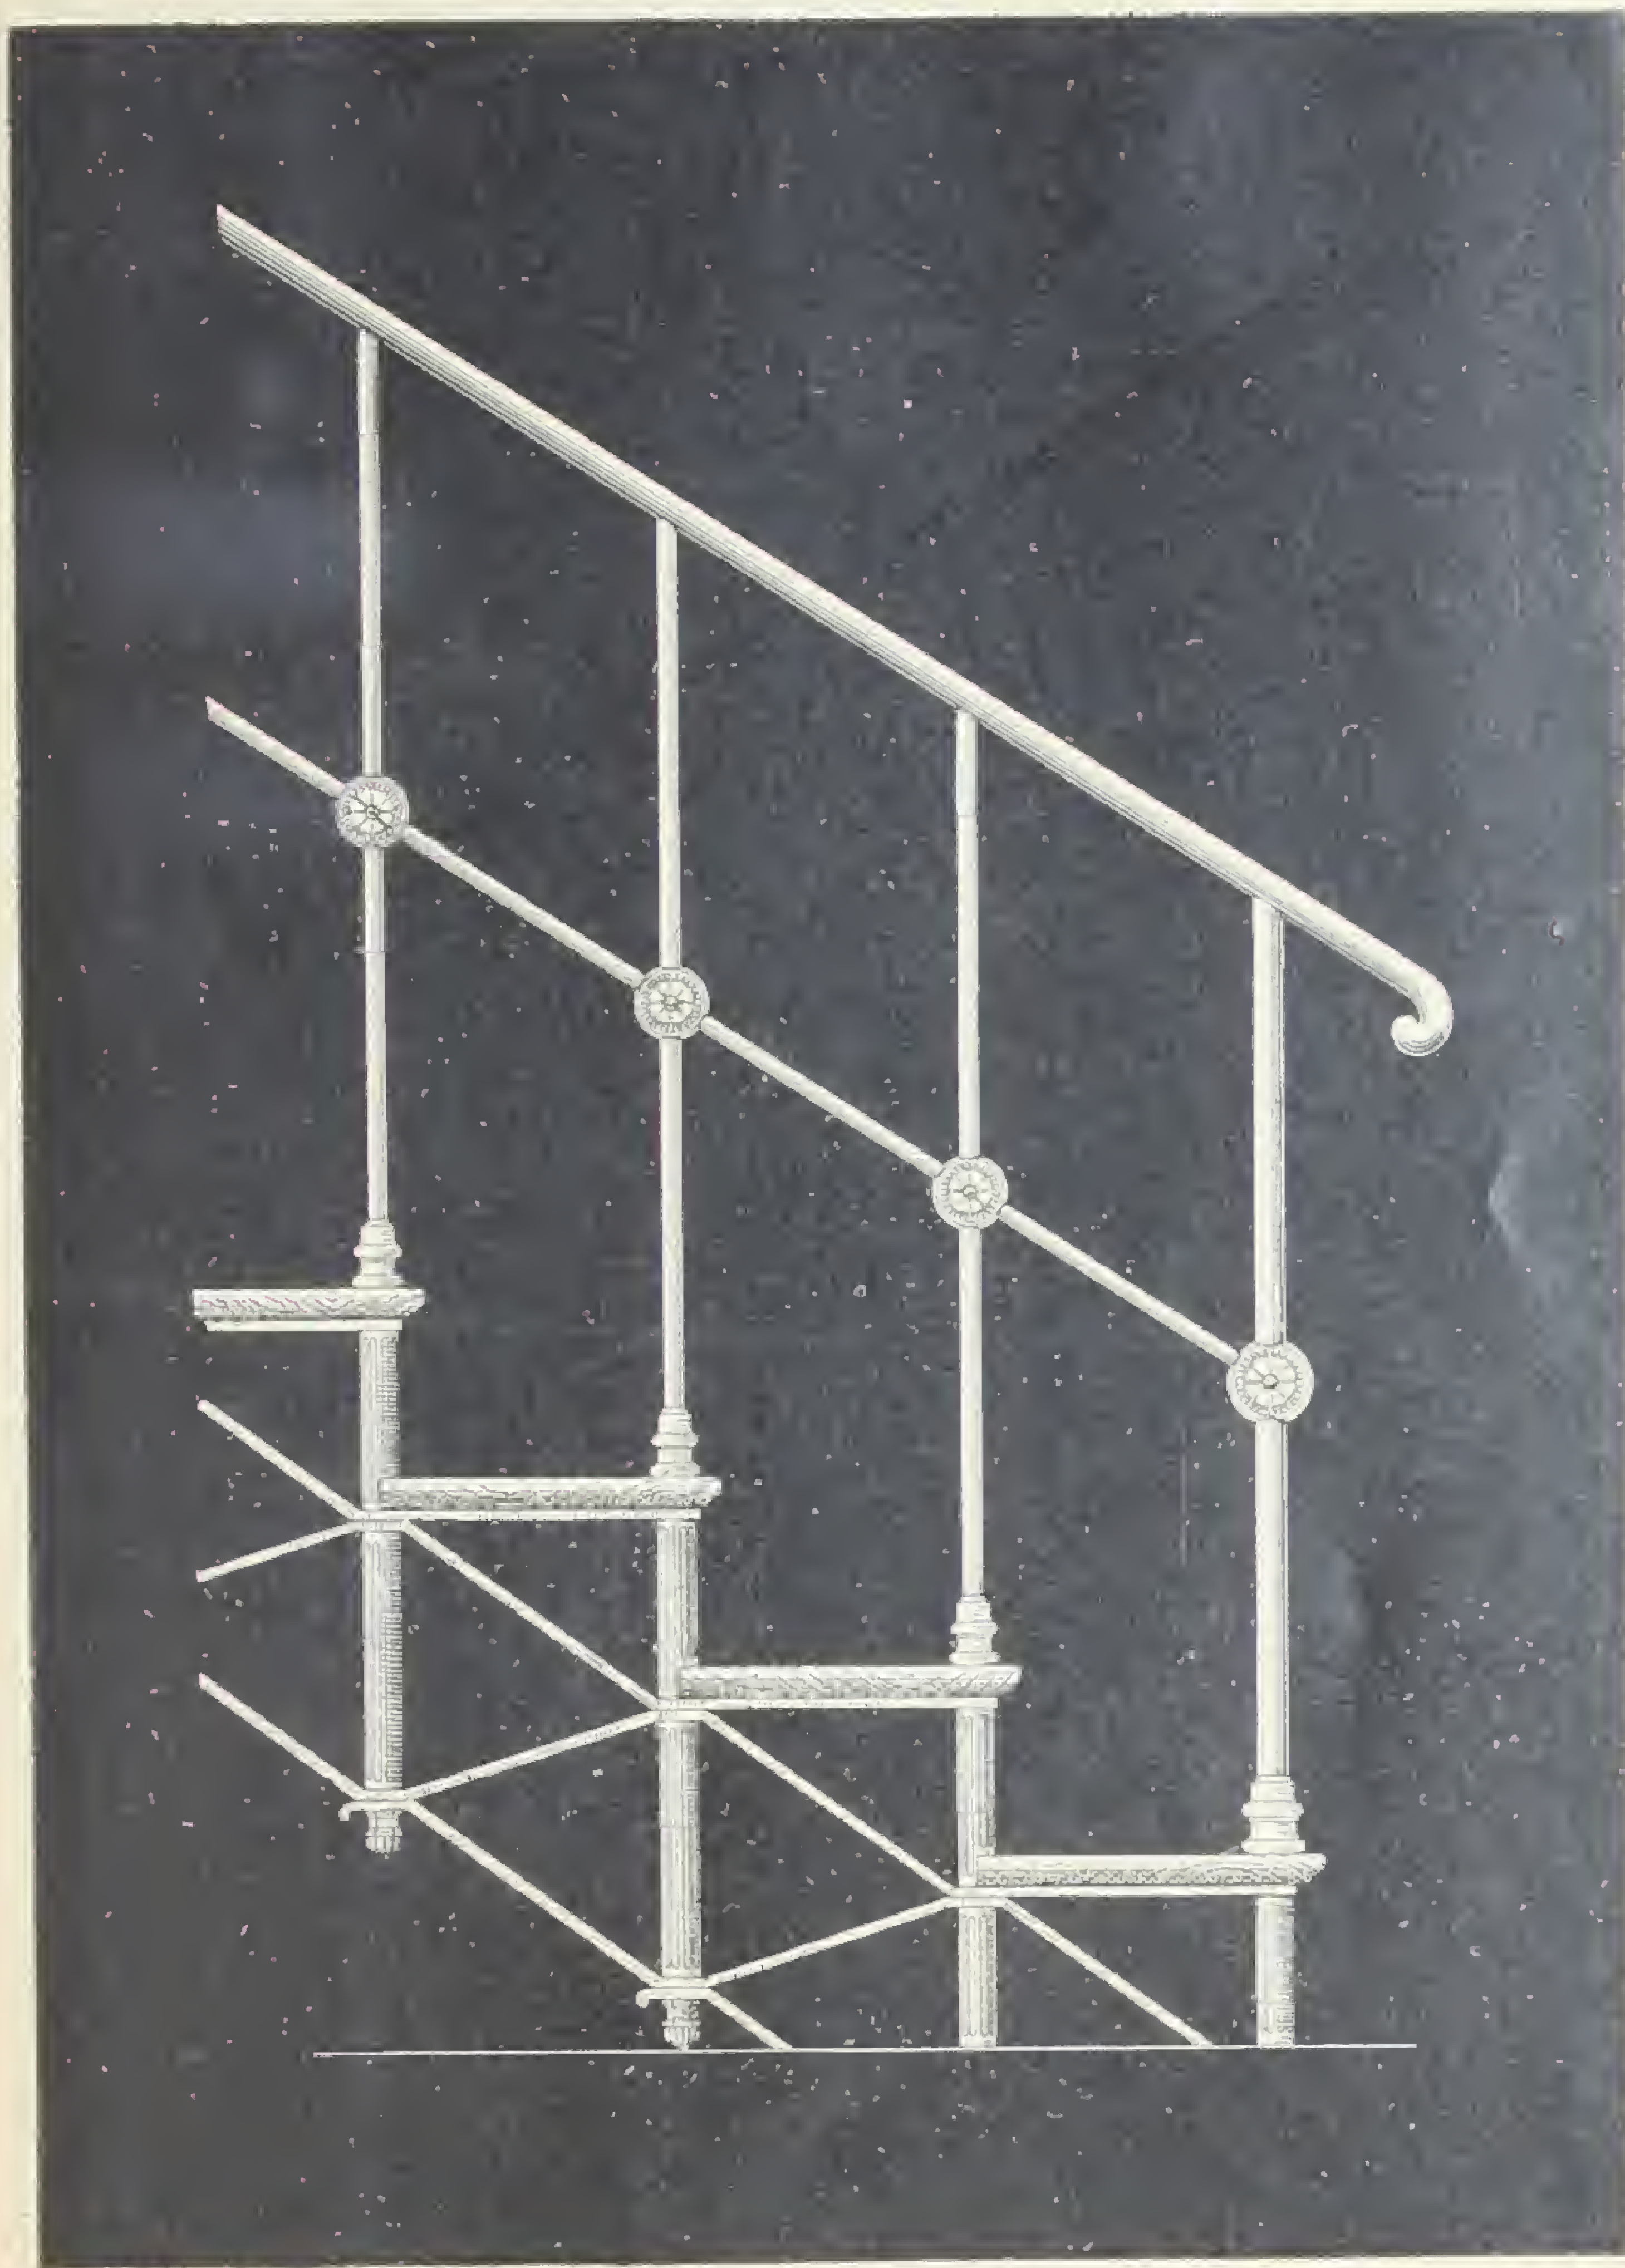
Joly's patent fireproof stairs for barracks, schools, etc.
